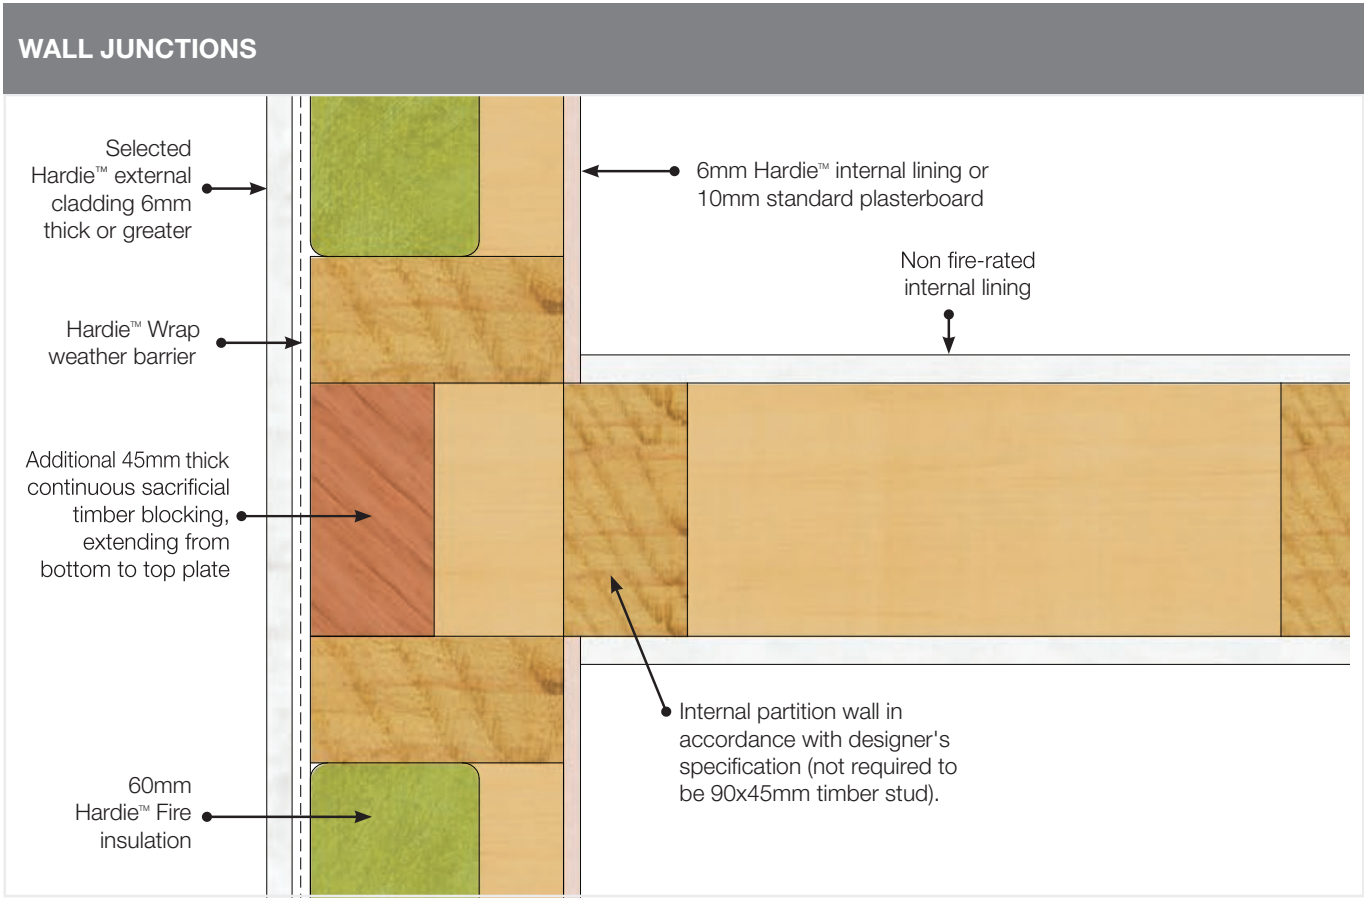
NON FIRE-RATED INTERSECTING FIRE-RATED BOUNDARY WALL
